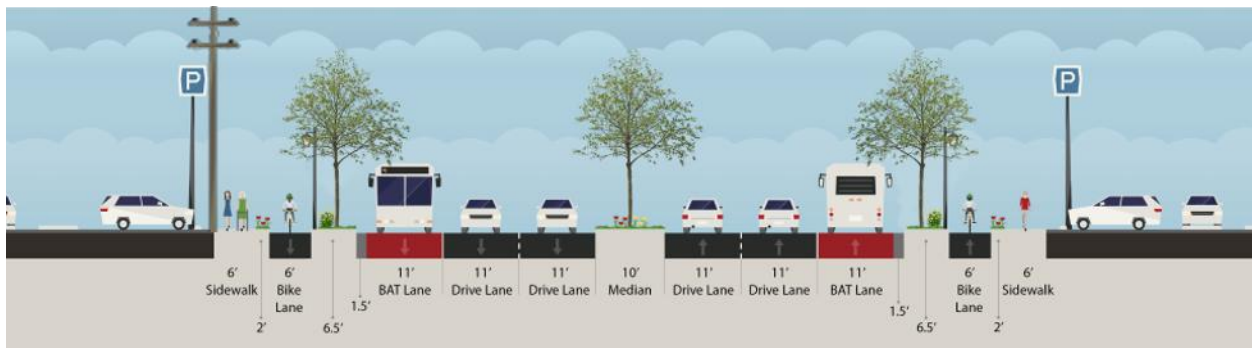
Corridor-Wide Concept 2 Cross Section (Source: Streetmix)
